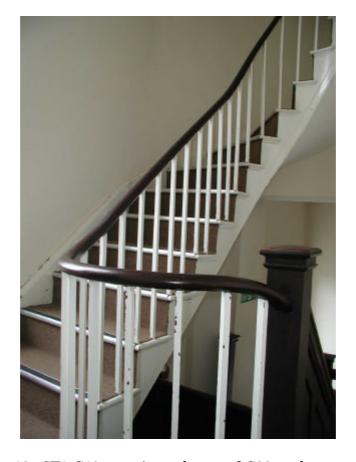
ST1 C19 stair (newel post of C20 replacement)
